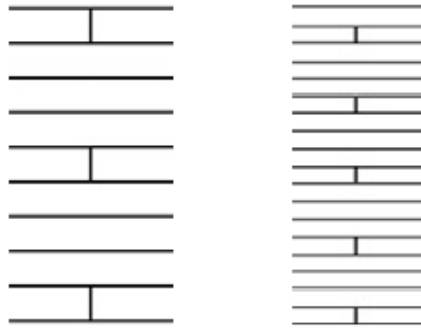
The particular section at midspan of Element 10 (left) and Element 11 (right)
